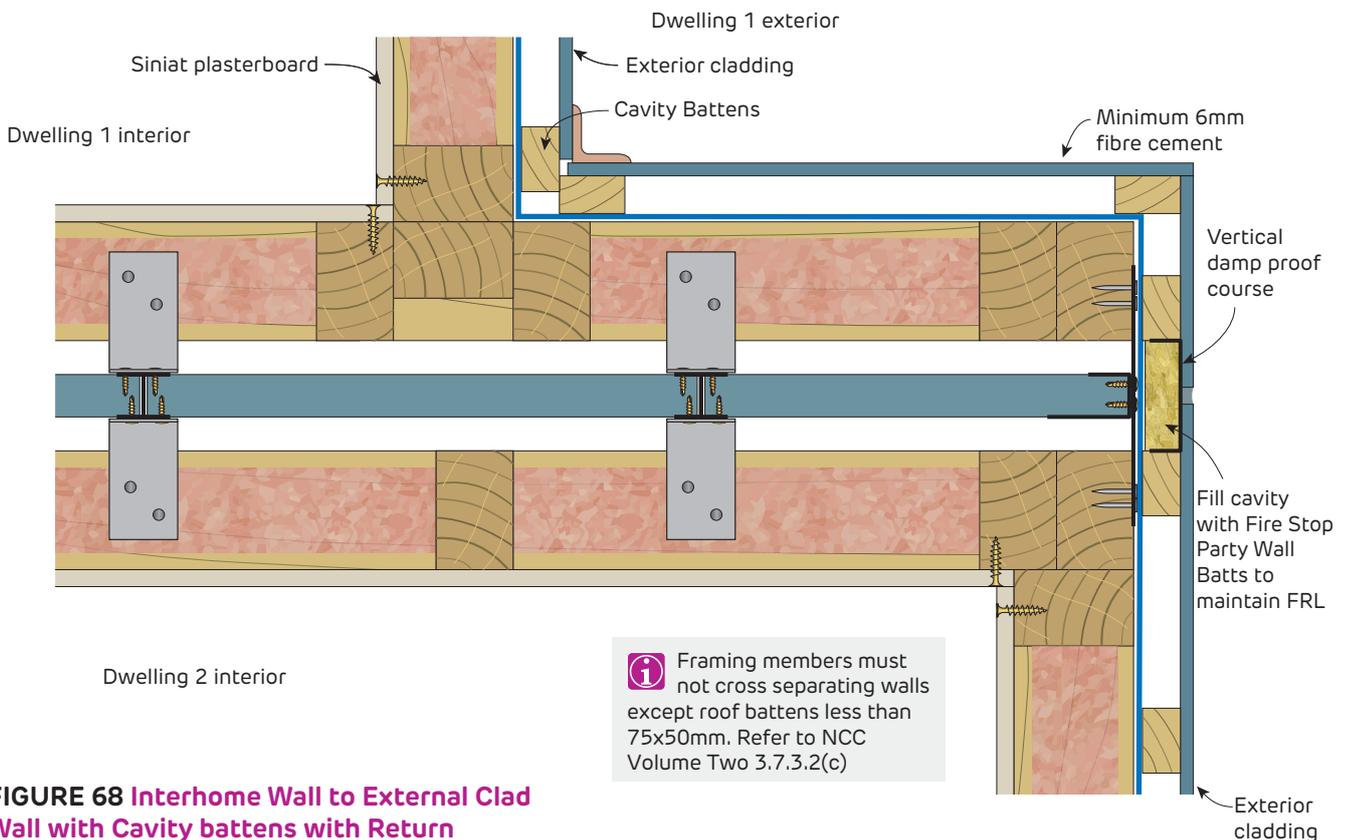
Interhome Wall to External Clad Wall with Cavity battens with Return
